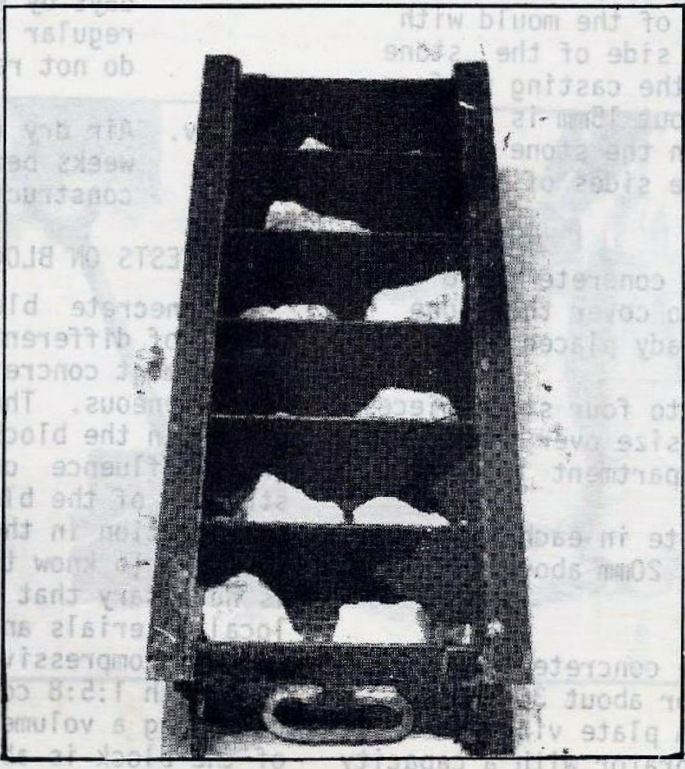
MOULD WITH STONE PIECES IN POSITION
